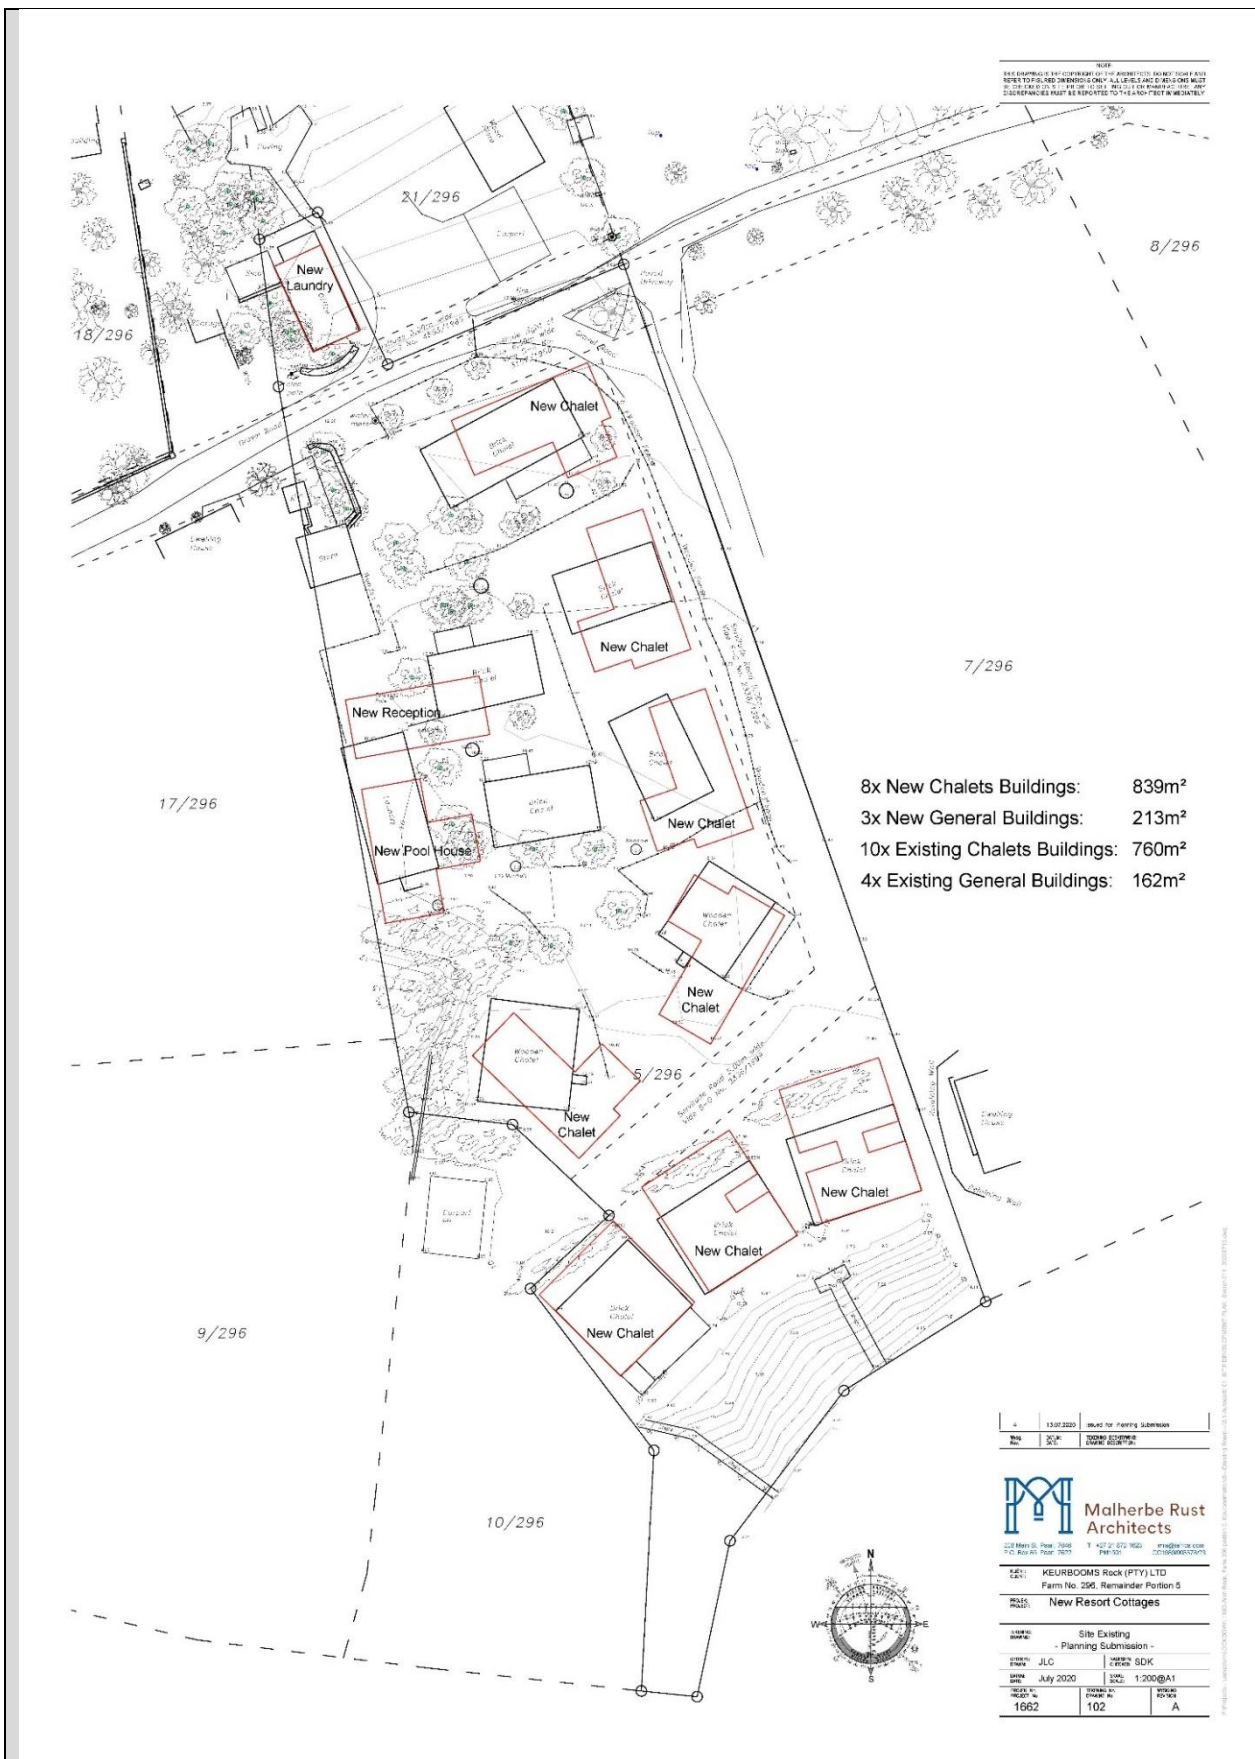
Site Development Plan vs Existing layout (Malherbe Rust, 2020)
